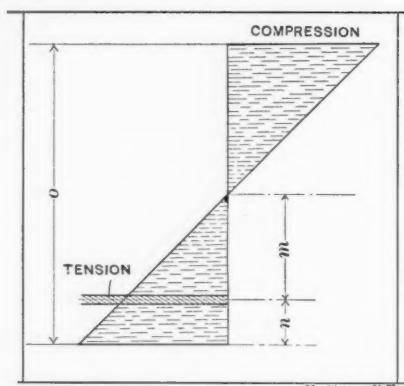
Calculation for Reinforced Concrete Steel Beam.
